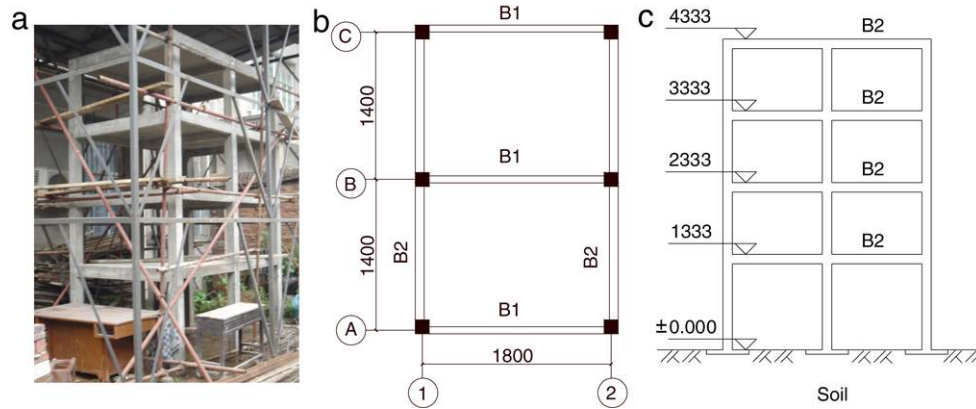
Frame Configuration; (a) Photo of the model frame structure; (b) Plan view and dimensions; (c) Elevation of North–South frames (all dimensions are in mm).
